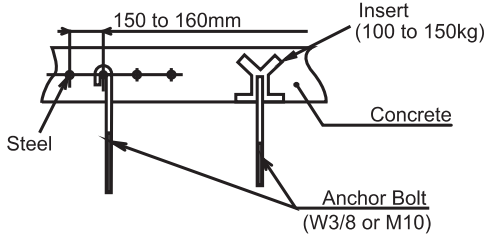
Opening of False Ceiling and Suspension Bolts
